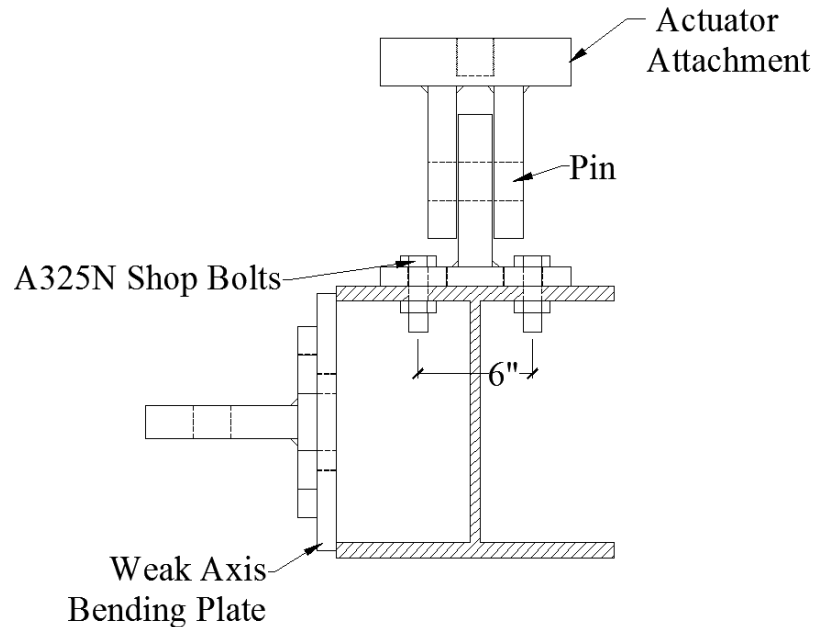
Vertical actuator connection details for 28B4 (W14x99) beam
